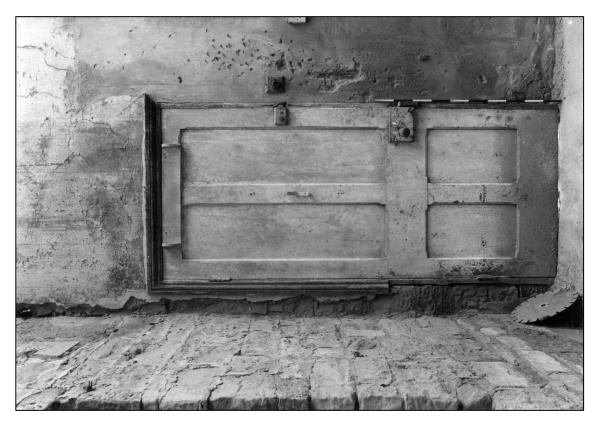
Door at west end of north wall of central room, looking N (photo 2/5) (top to left).
